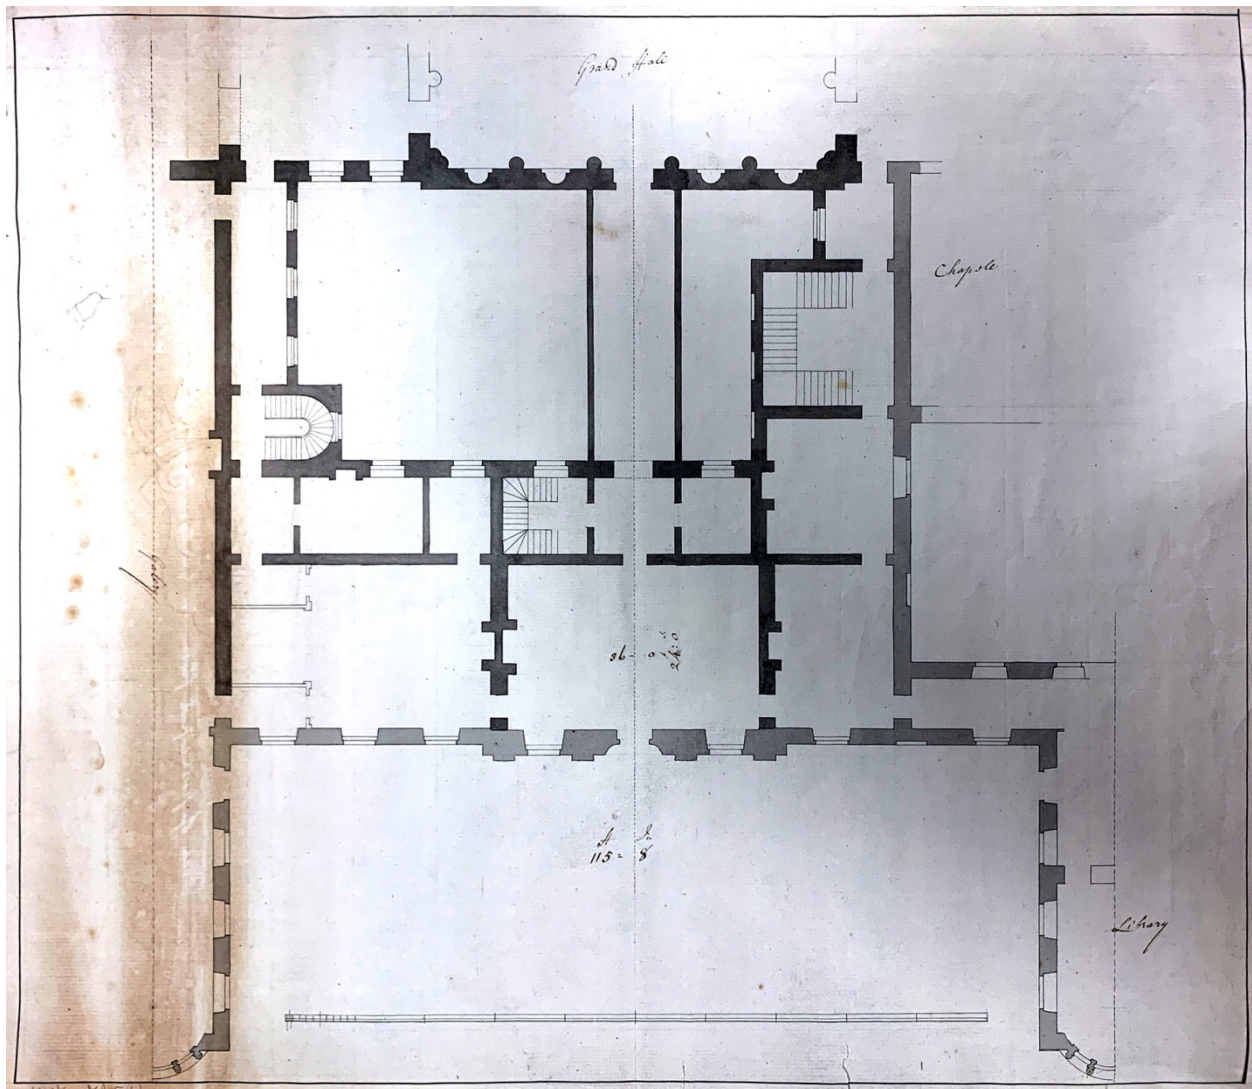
Plan of principal floor in Garden front showing alternative staircase plans, John Carr (?), n.d. WWM MP 5(b).
